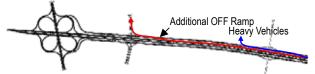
Recommended Modification of the LHLE Connection Plan (Inflow)
